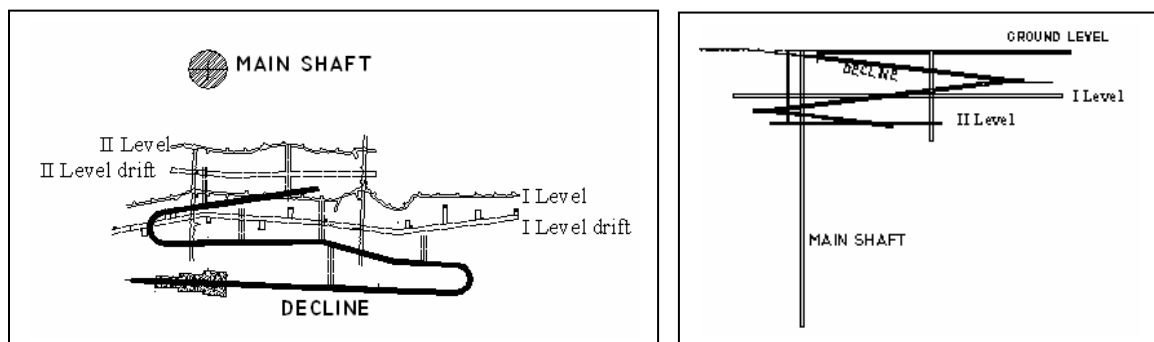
Plan showing Bagjata mine layout & Section showing Bagjata mine layout.
